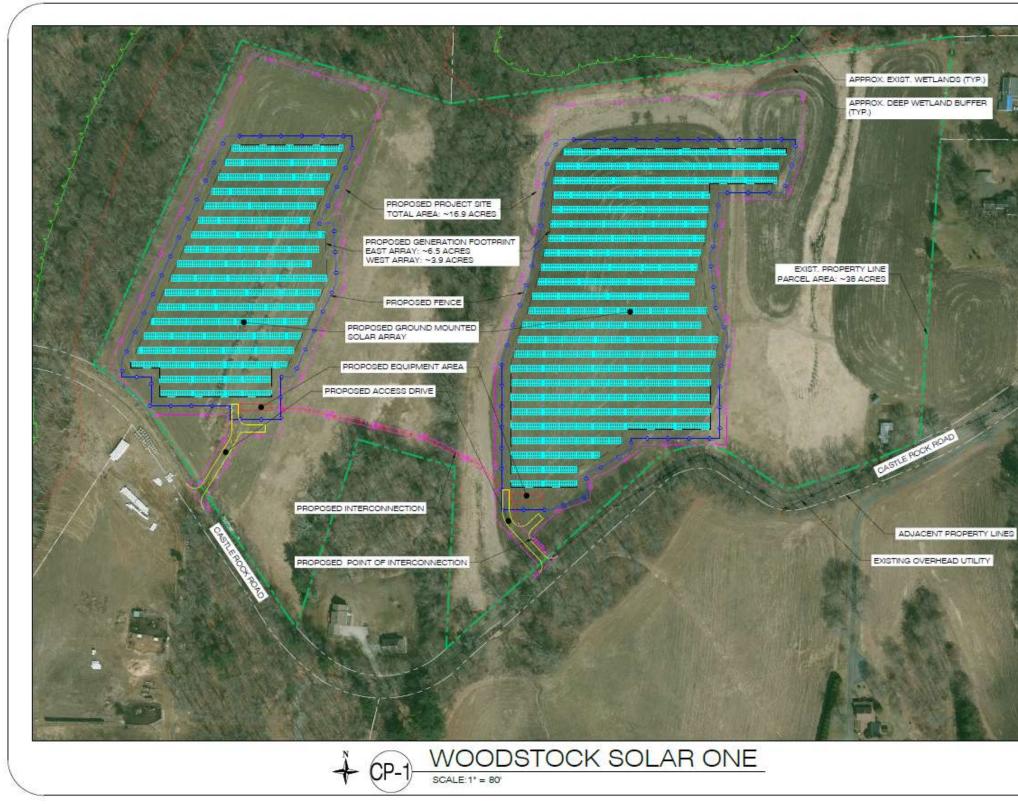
Project plans for the proposed Woodstock Solar Project at 11 Castle Rock Road in Woodstock, Connecticut.
